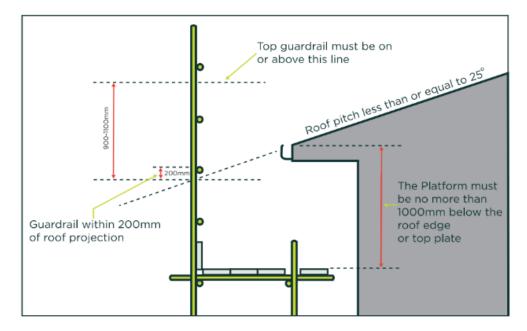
Roof edge protection for a roof pitch less than or equal to 25 degrees
